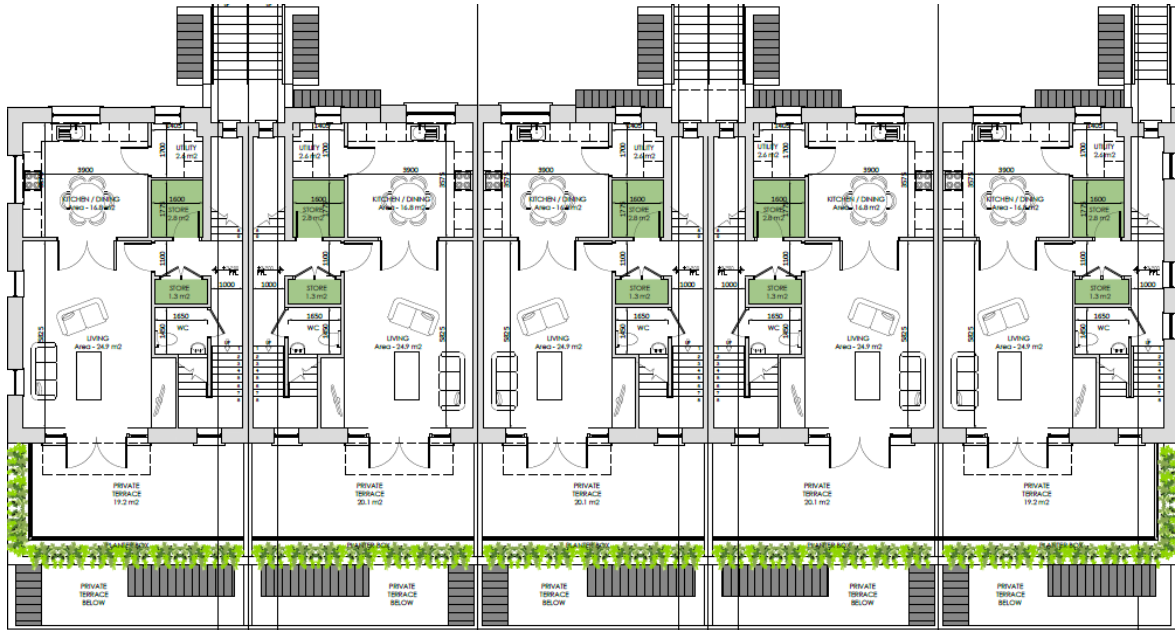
Proposed first floor plan of Duplex Apartment Block B.
